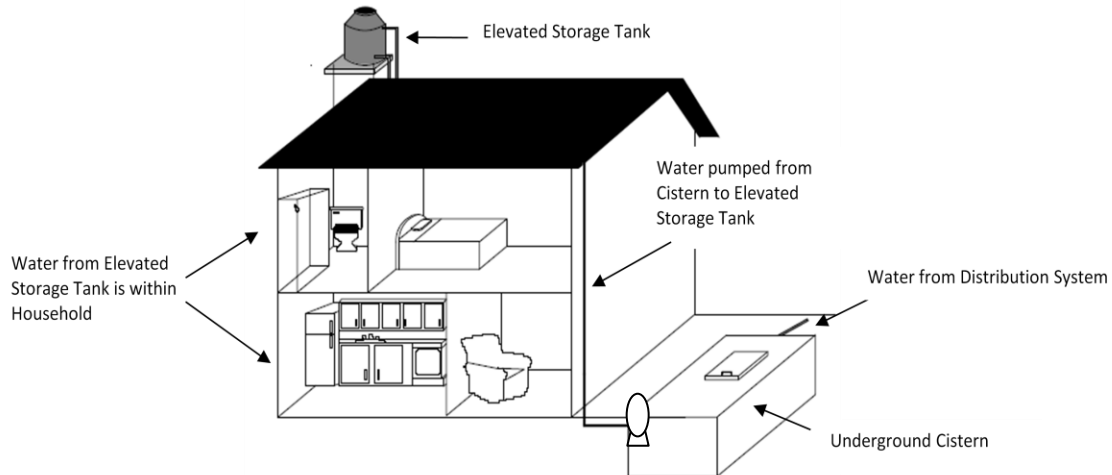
Diagram of household water system typical of Tiquipaya (Bolivia). Water flows from distribution system to an underground cistern to an elevated storage tank.
